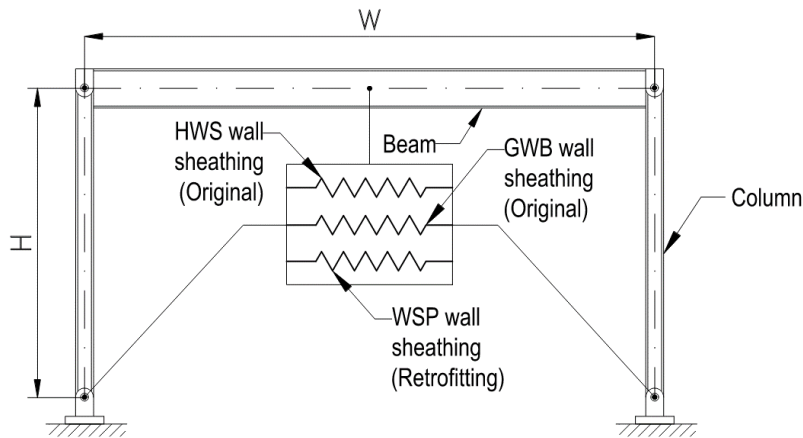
Schematics, and components of the original wood-frame building retrofitted with wood structural panel (WSP)
